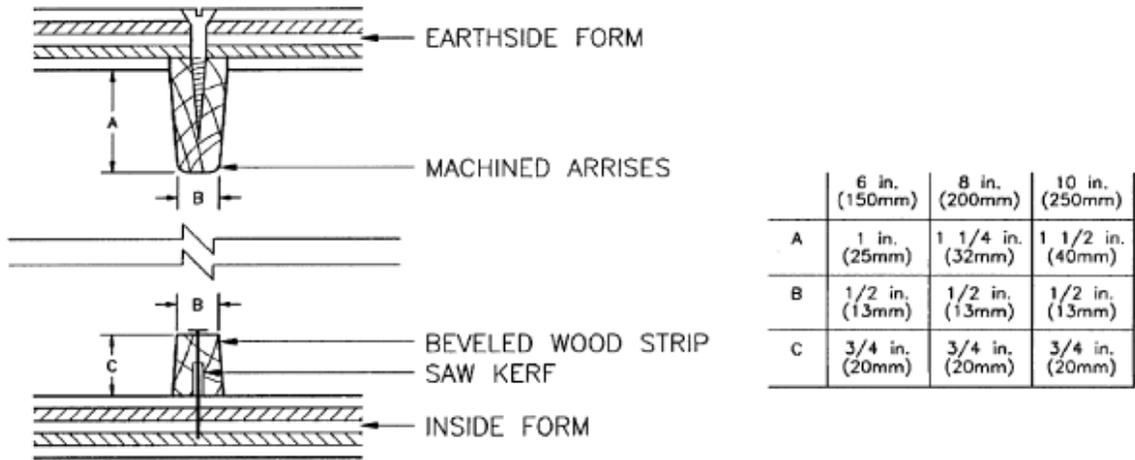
Forming contraction joints in walls (PCA 1984).
